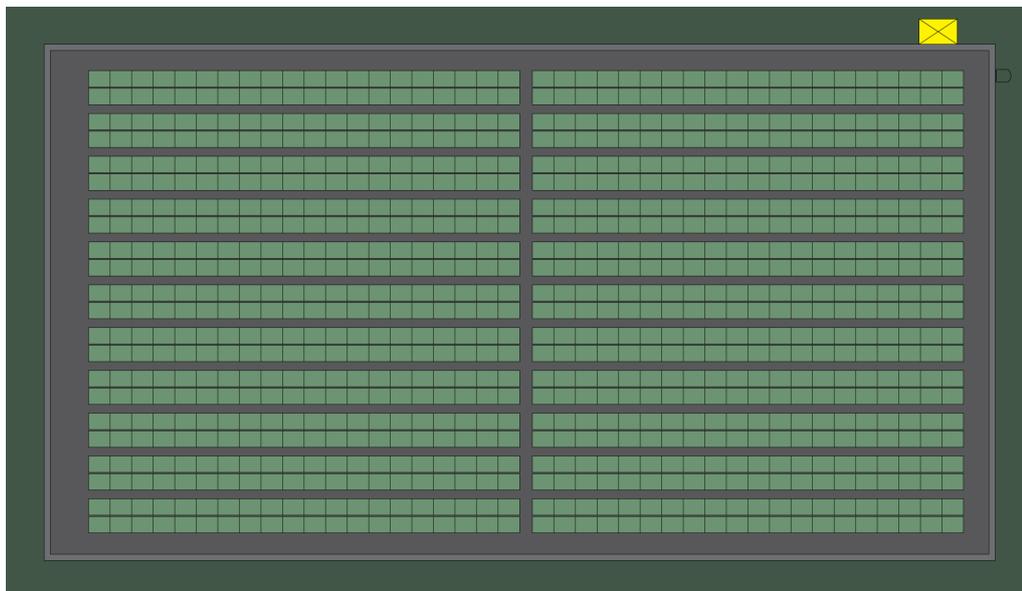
Rena Hav AB algae cultivation plant layout.
